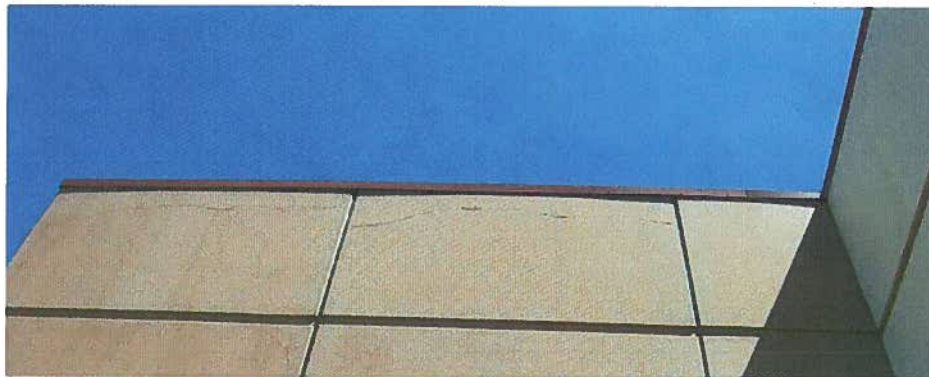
Horizontal cracking at the tops of panels. Vertical stains are visible below some portions of the cracks (Brenner photo)
